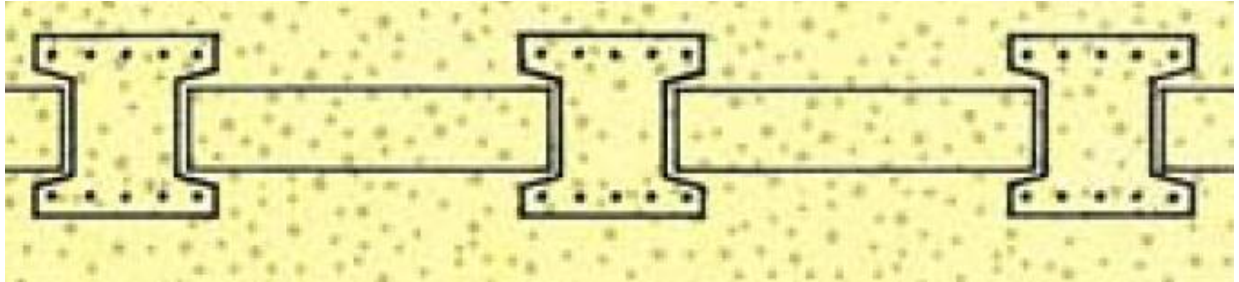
Soldier pile wall of concrete soldiers. (Franki piling, 2008)
